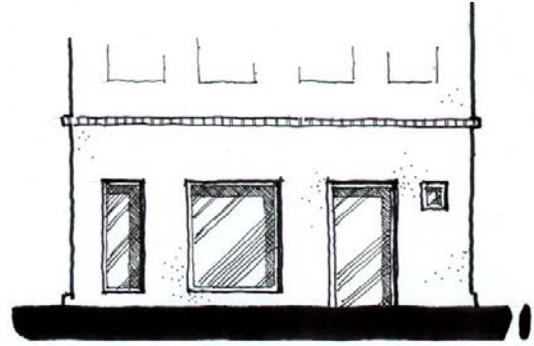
Ground level, street-facing facades shall have at least 50% clear glazing.
